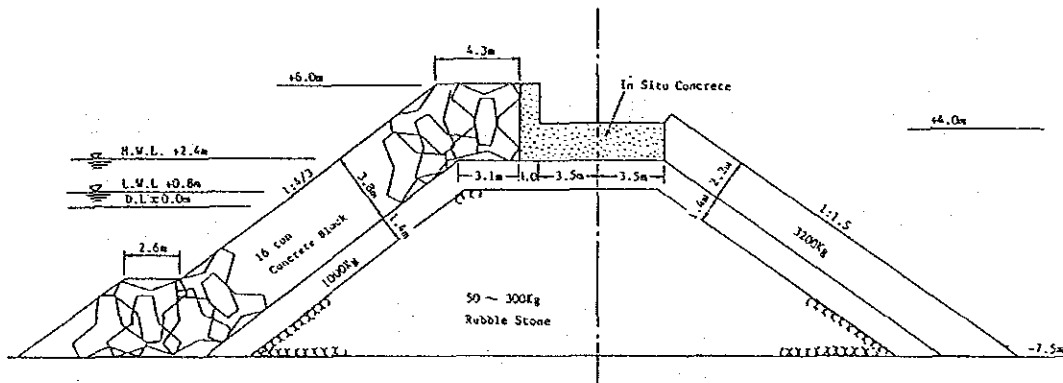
Standard Cross Section of the Breakwater (1)
